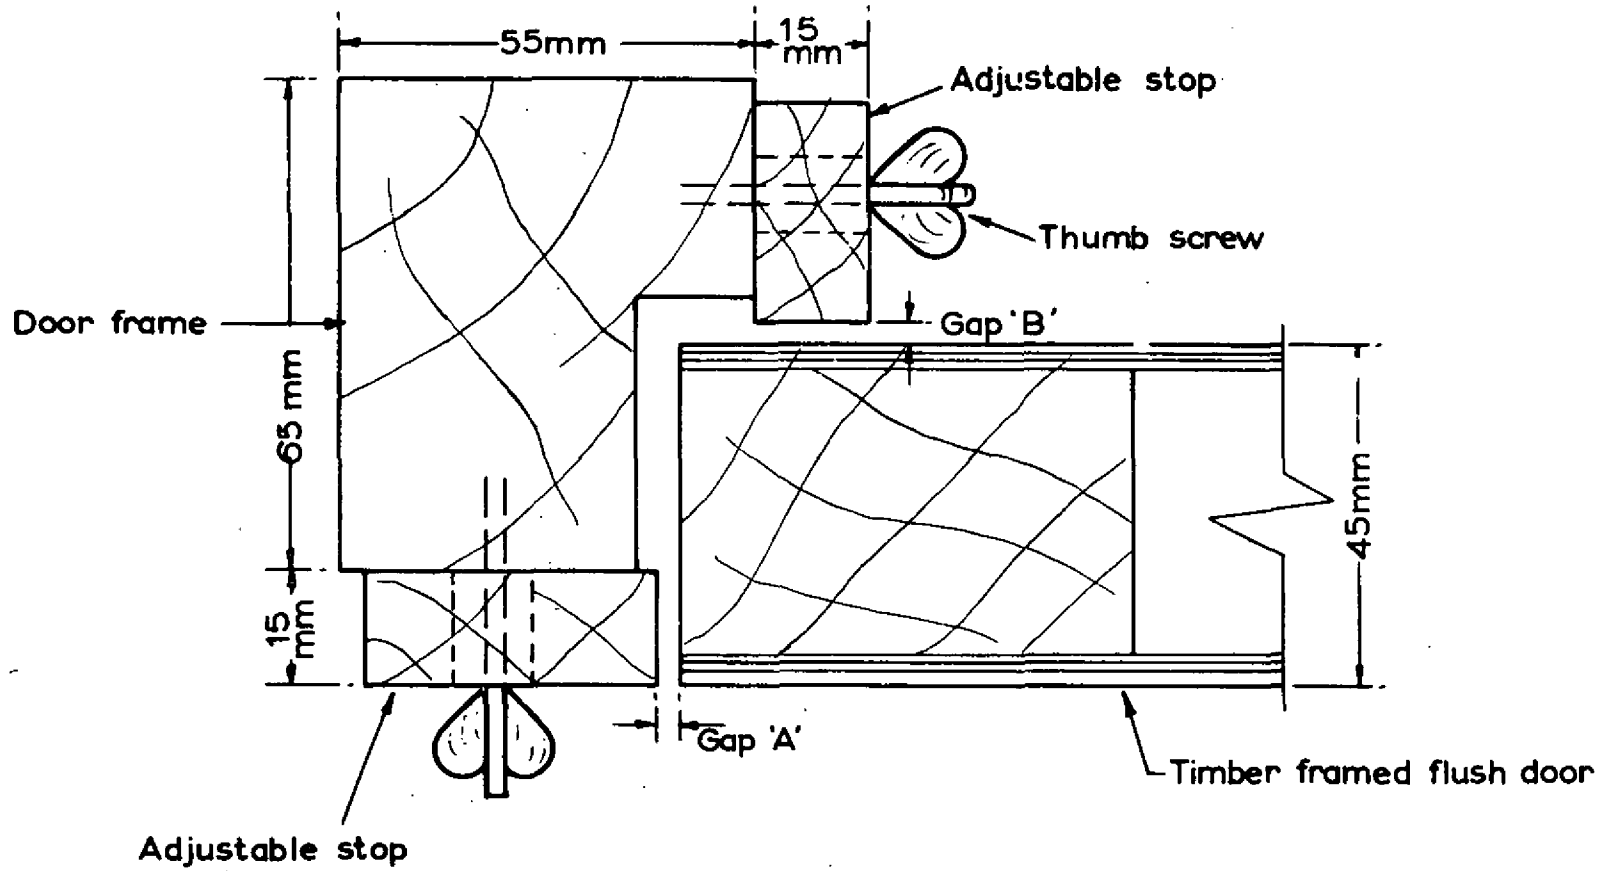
DETAILS OF ADJUSTABLE DOOR FRAME
